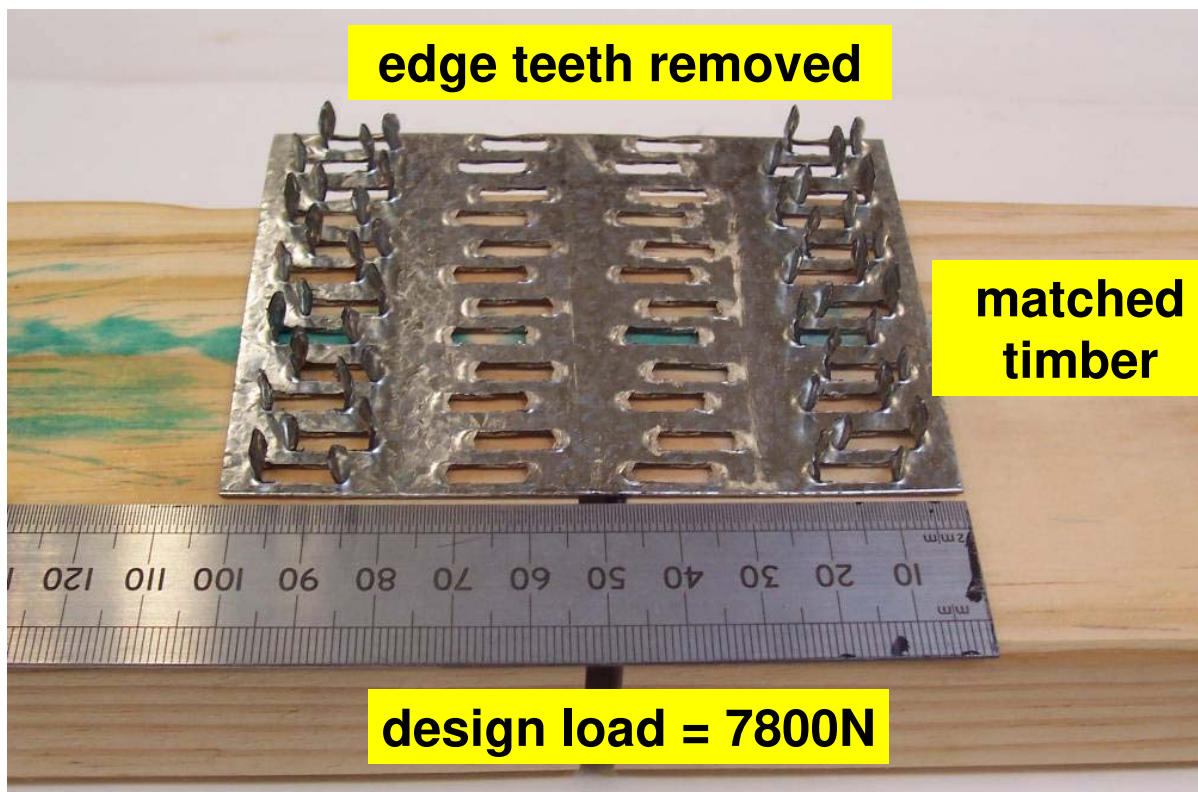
Example test specimen before pressing, teeth near edge removed
